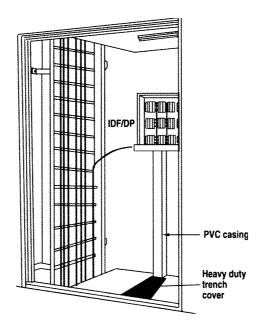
FLOOR TRENCH IN CENTRE OR RISER
